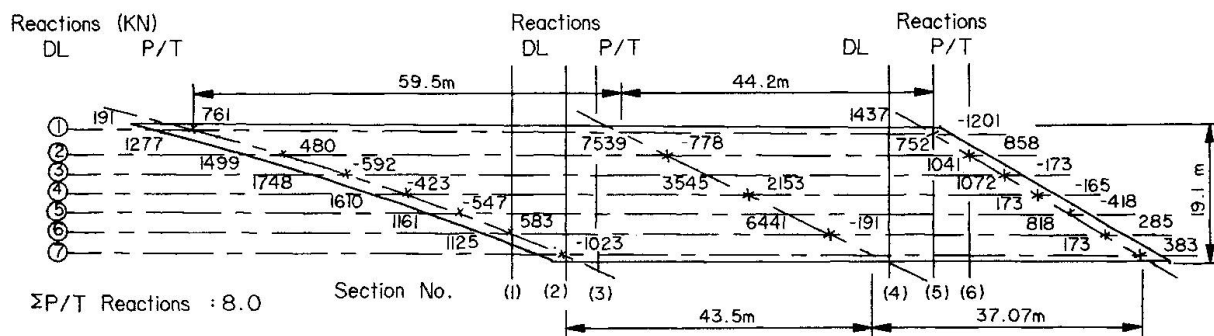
Sectional Framing Plan With Support Reactions for Euclid/Park Ave. Bridge
